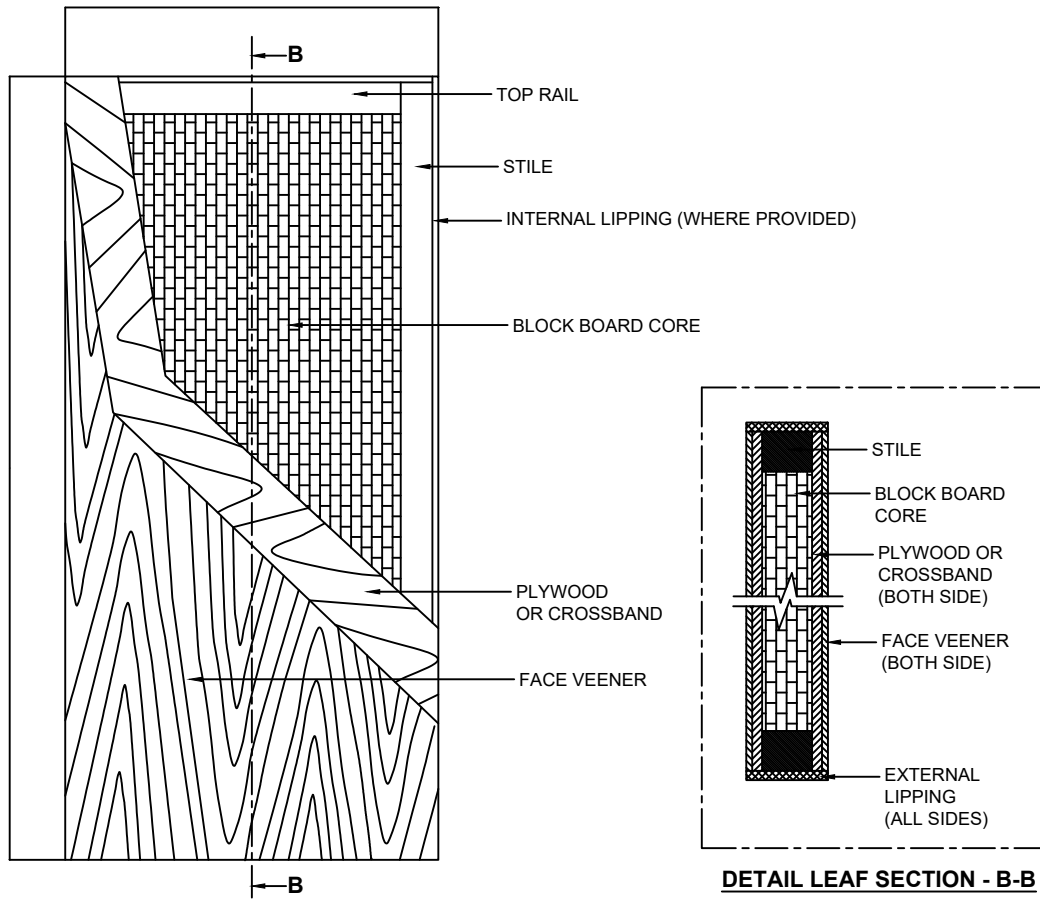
TYPICAL SKETCH OF BLOCK BOARD CORE FLUSH DOOR SHUTTER
